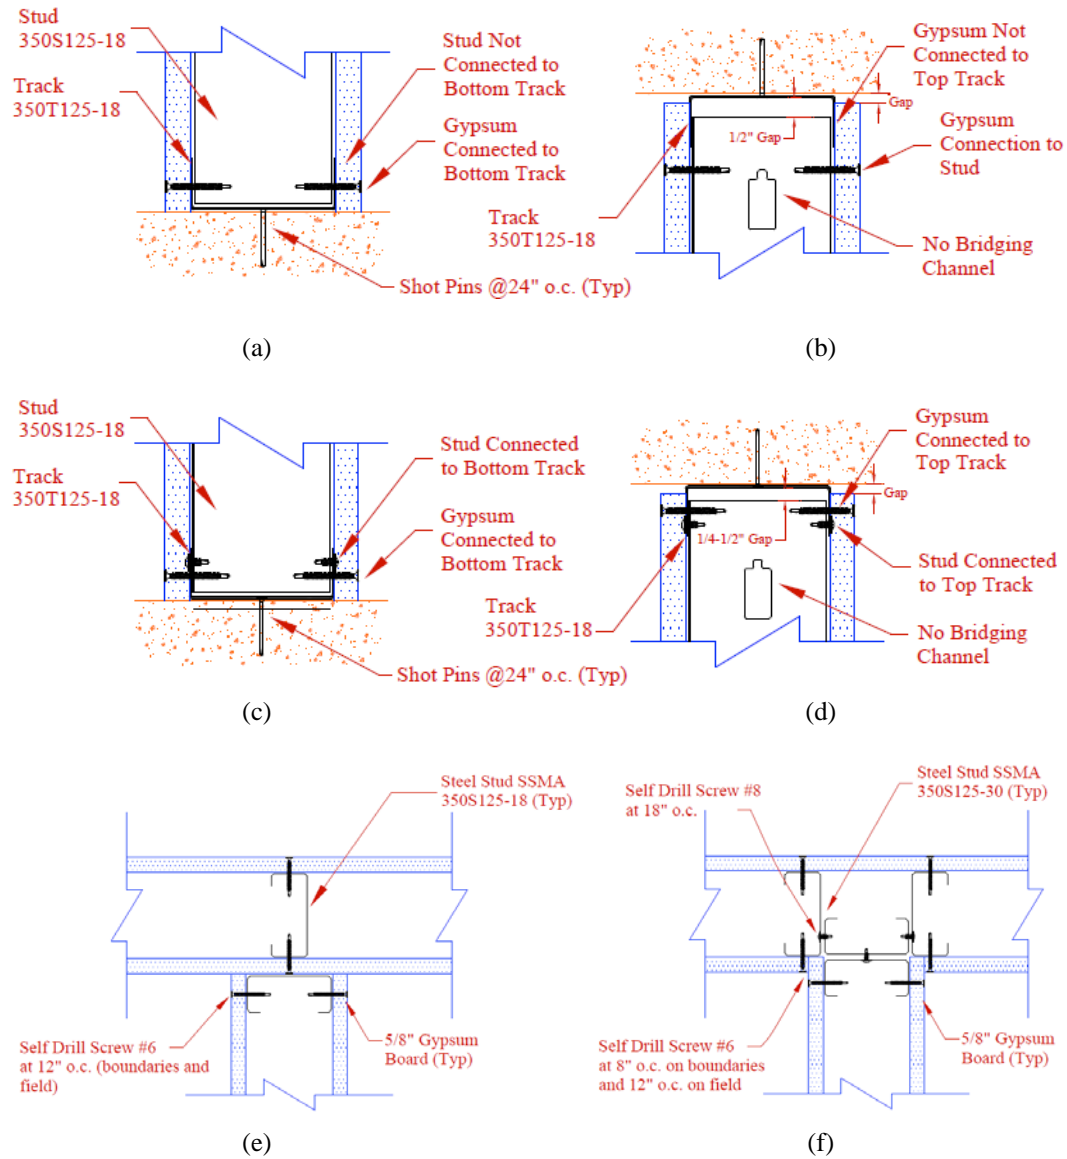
Sheathing and framing connectivity details: (a-b) bottom and top track connections for partially connected specimens (slip track), (c-d) bottom and top track connections for fully connected specimens, (e) wall intersection details for commercial construction practices and (f) wall intersection details for institutional construction practices.
